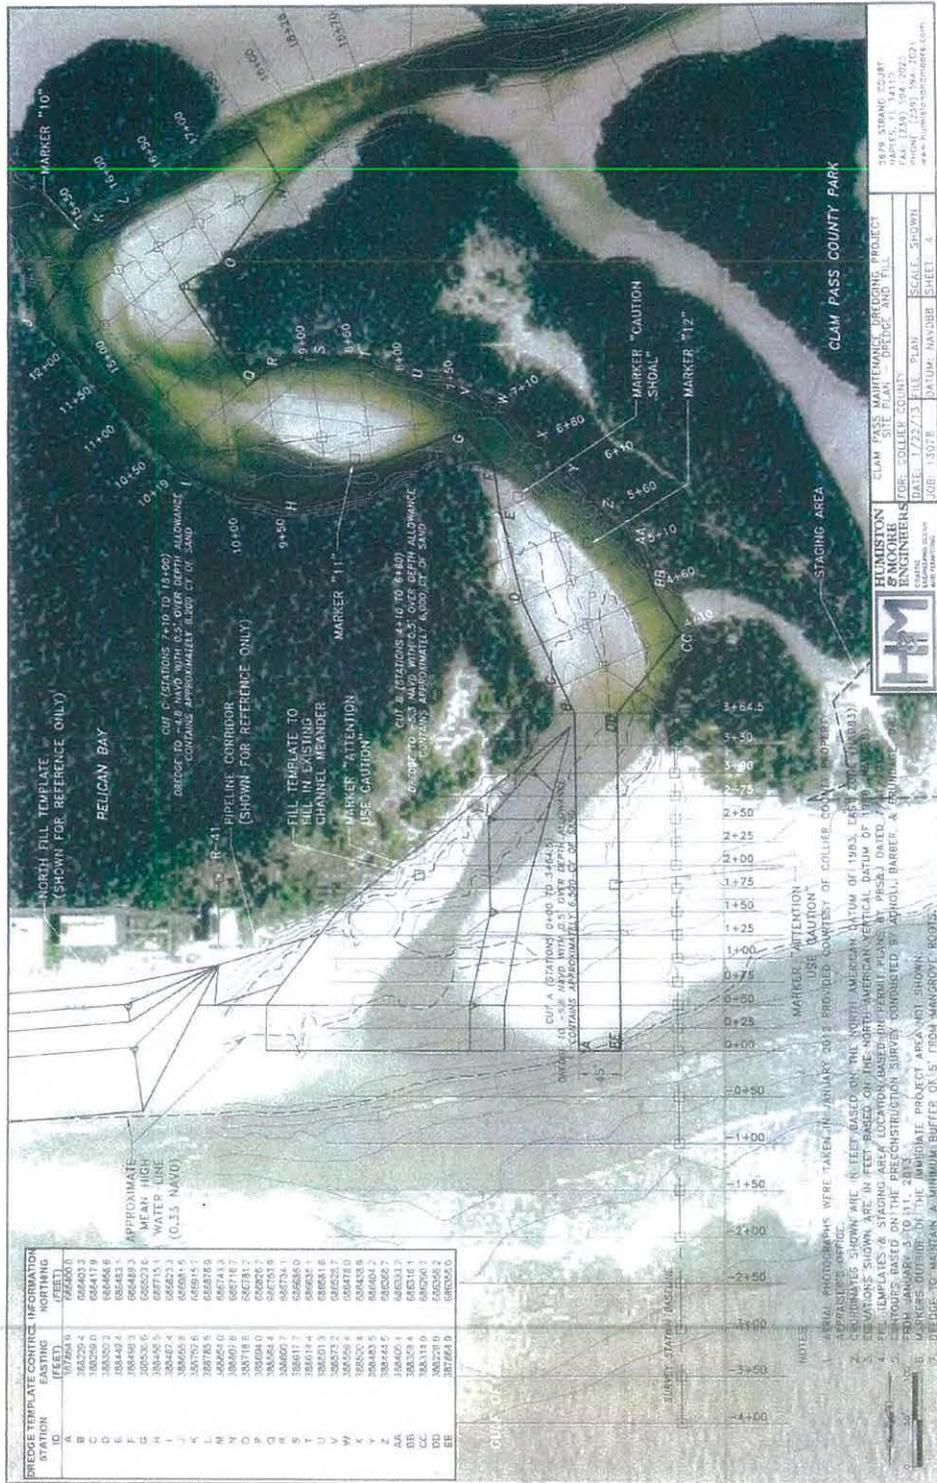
Proposed dredging template and elevations in Clam Pass, Collier County, Florida.
